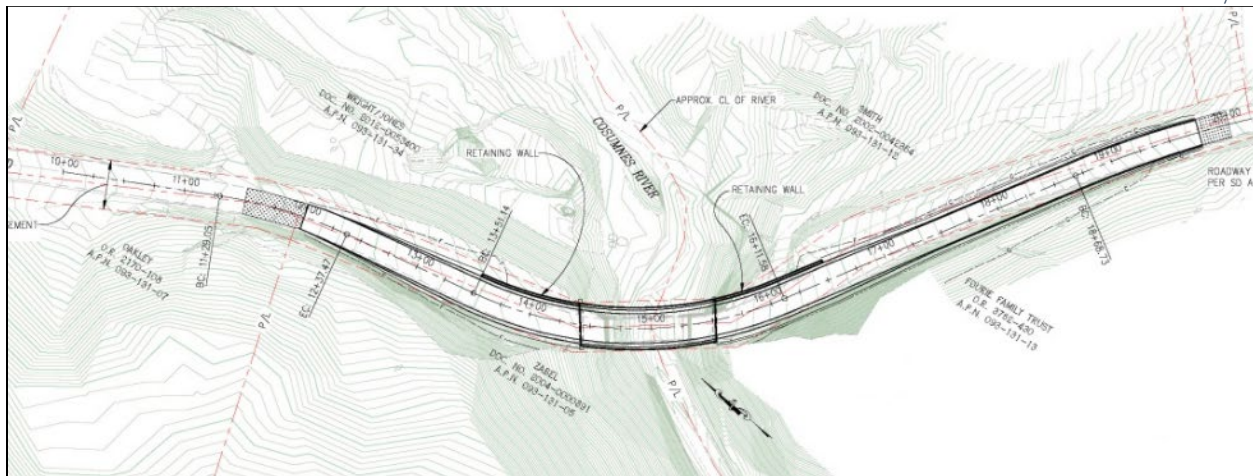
30-mph Alternative, With Retaining Walls, Proposed Project for 2024 EIR
